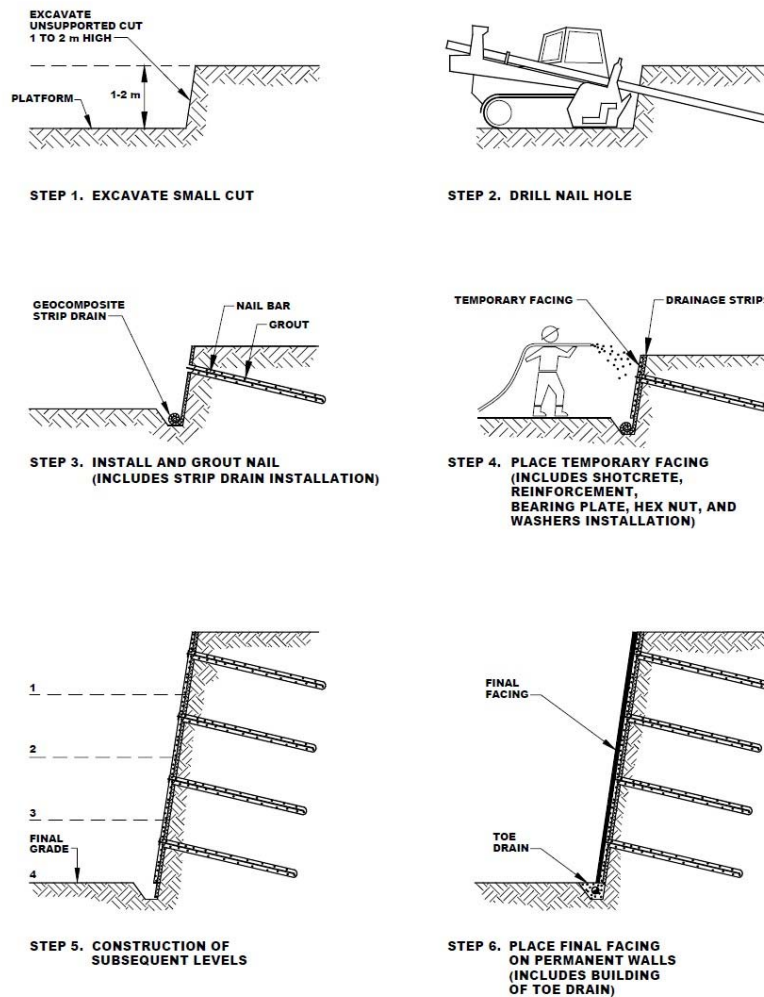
Typical Soil Nail Wall Construction Sequence (after FHWA, 2003).
